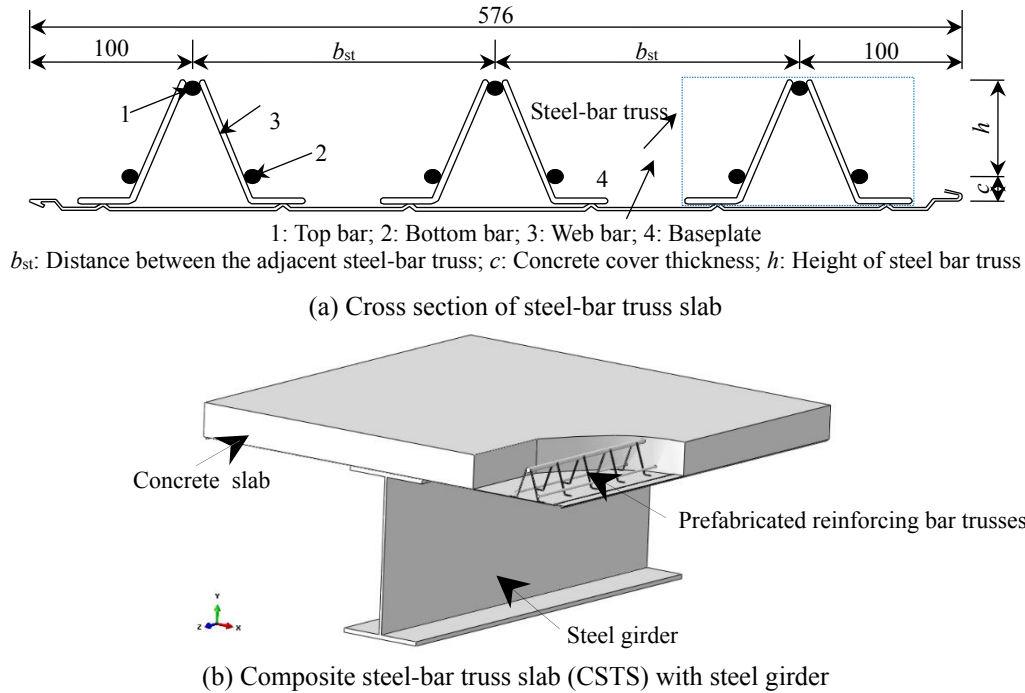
Diagrams showing the composite steel-bar truss slab with steel girder (unit: mm)
